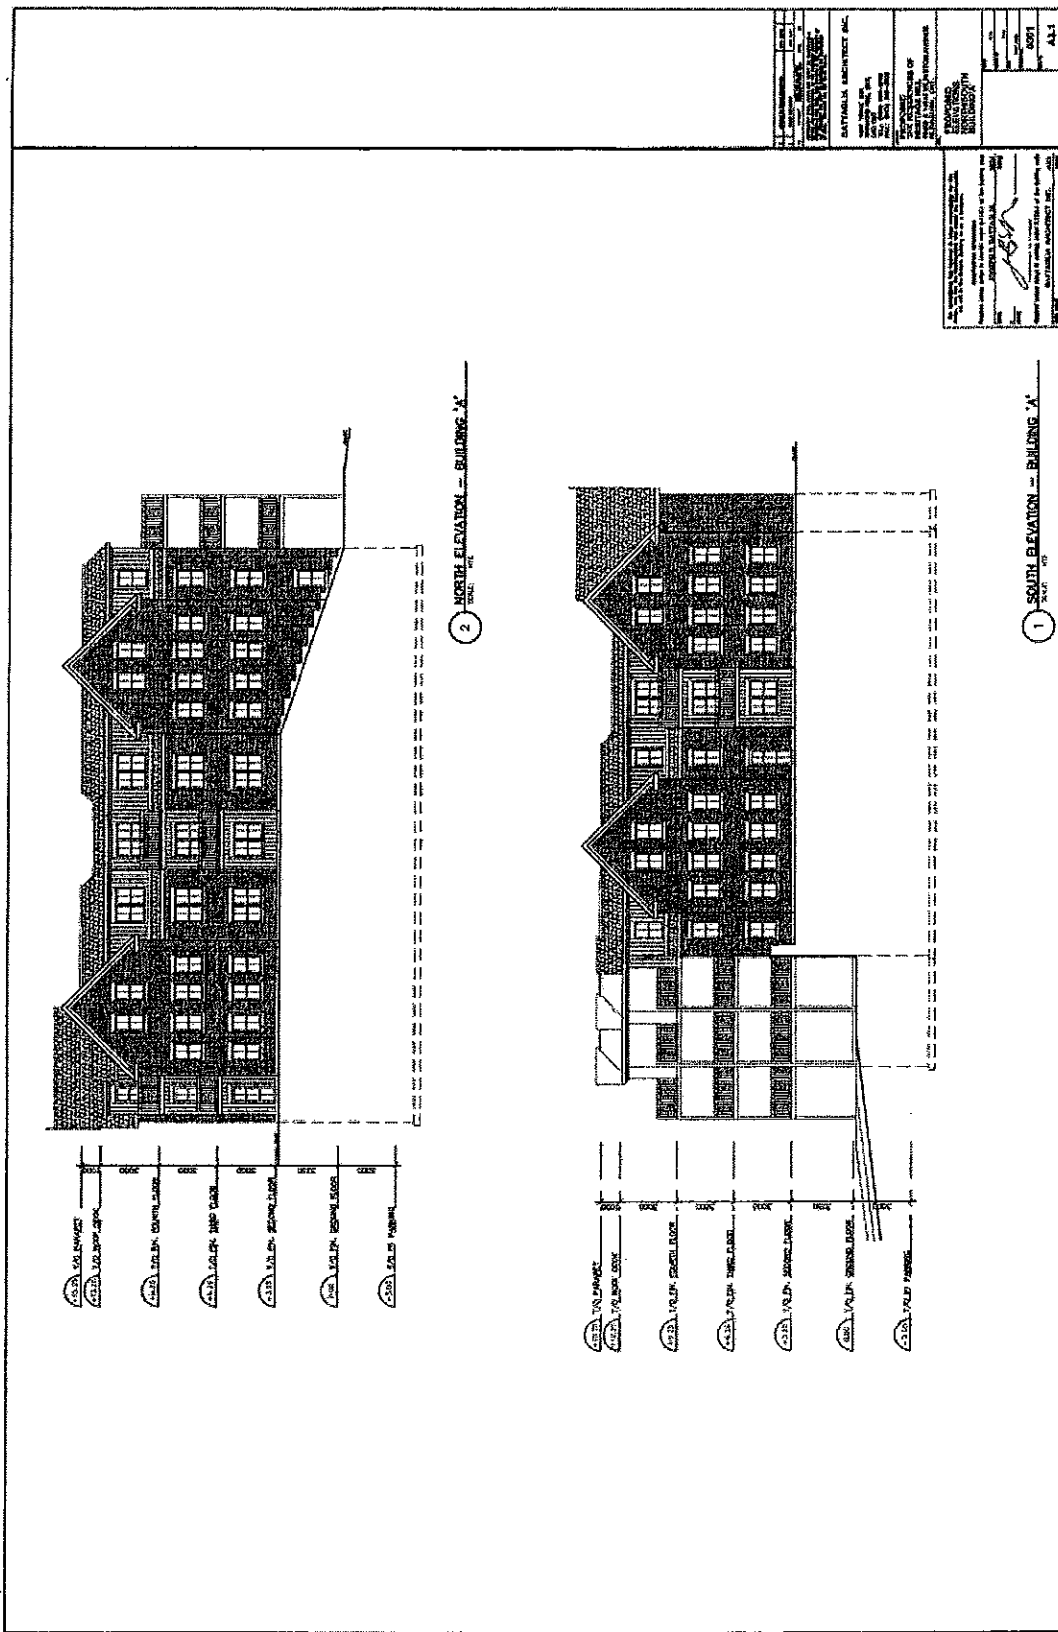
Proposed Side Elevations “Building A” (28 November 2008)
